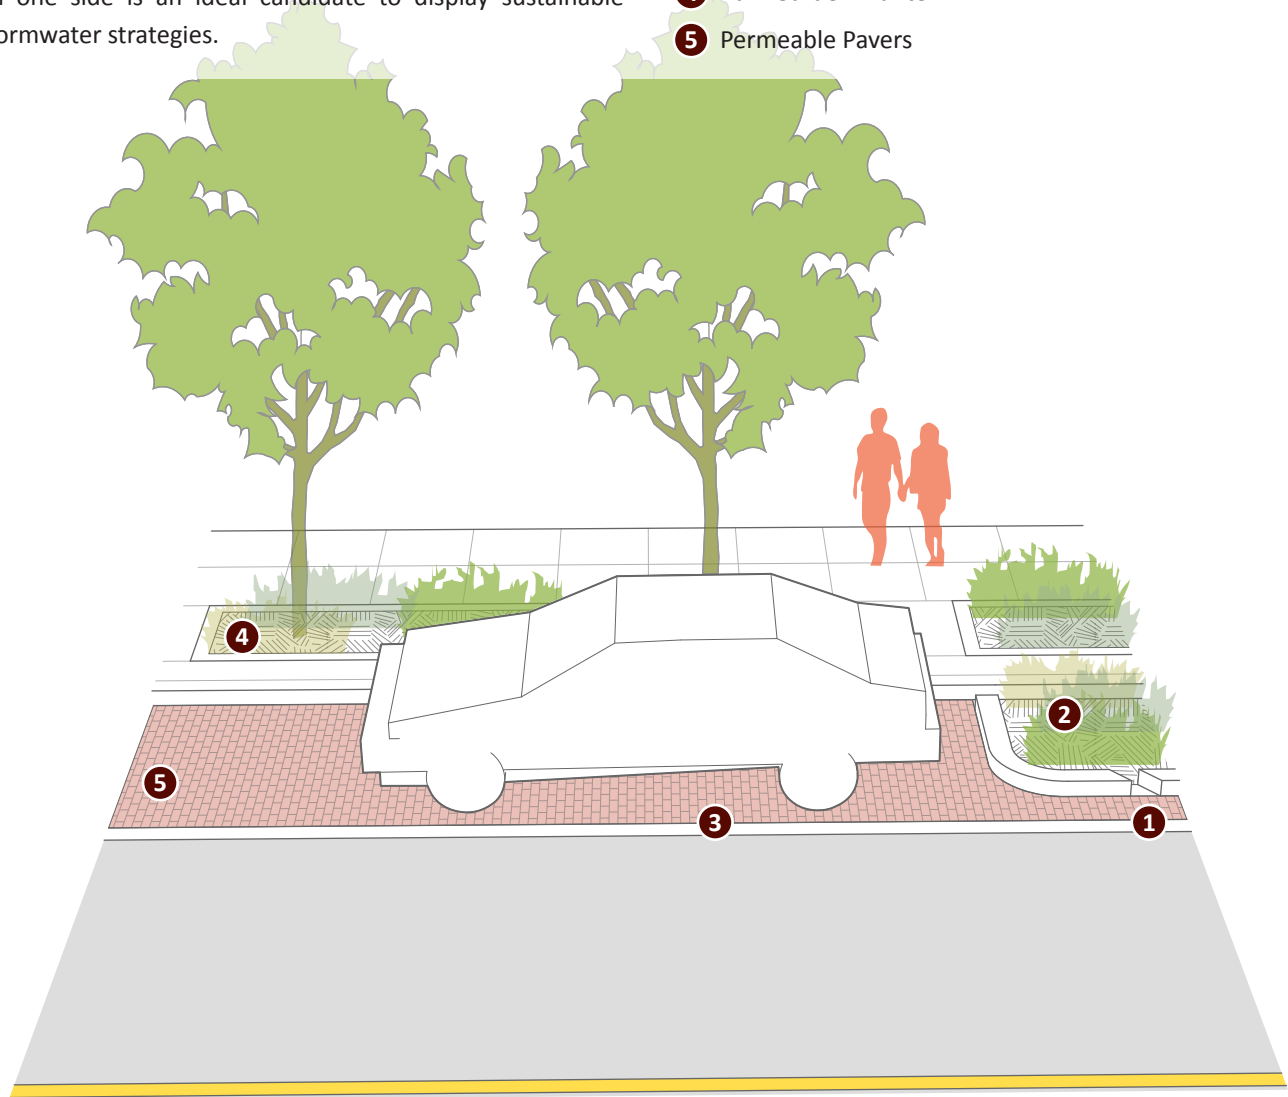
Van Emmon Street Diagram (Farr Associates)
